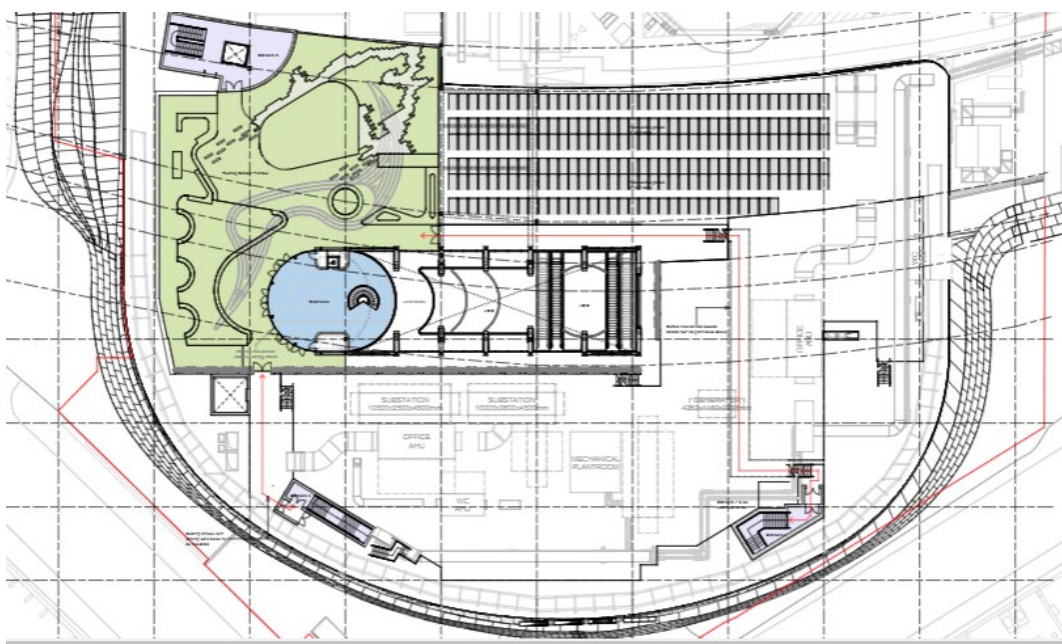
Proposed roof plan, showing landscaping, PV panels and atrium
